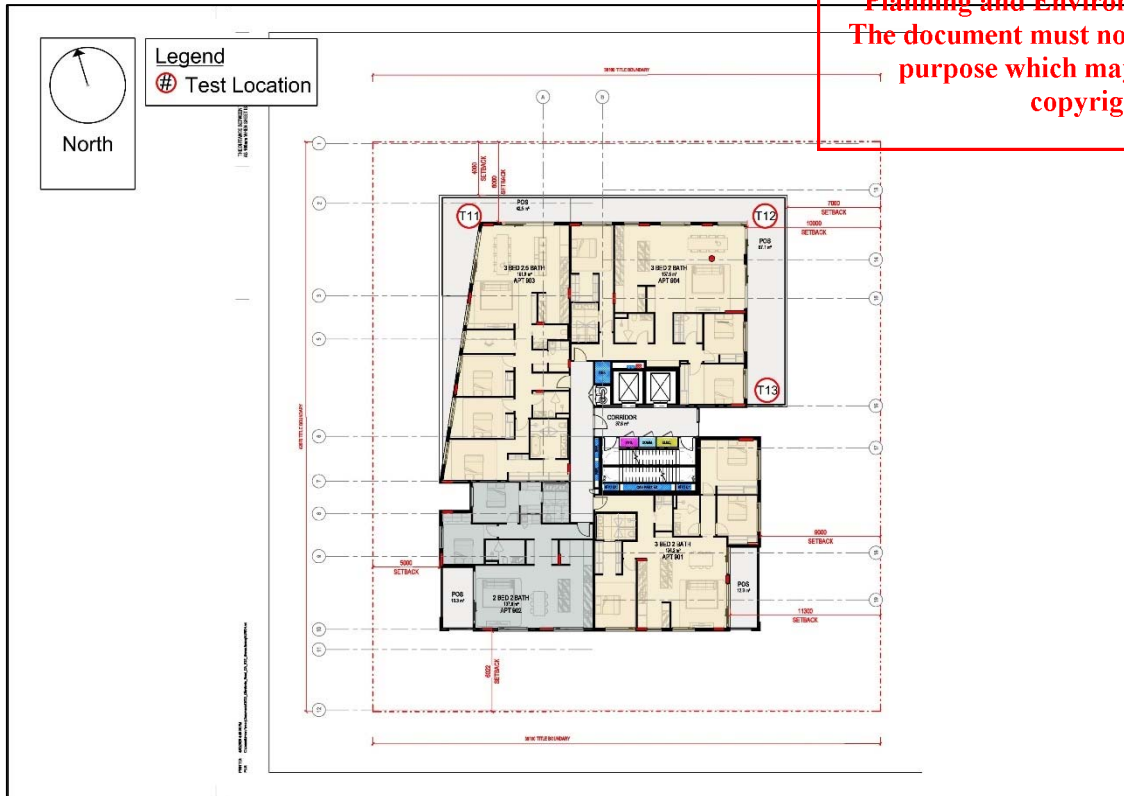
Test Locations on Level 9 of proposed 846-858 Glenferrie Road development.
